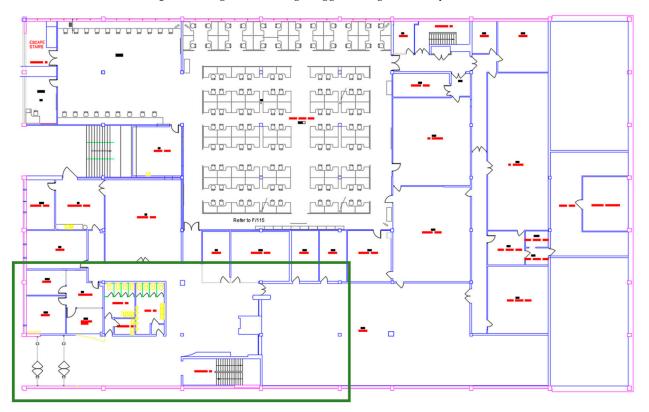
Ground floor plan of the George Begg building (case study part in green box).
